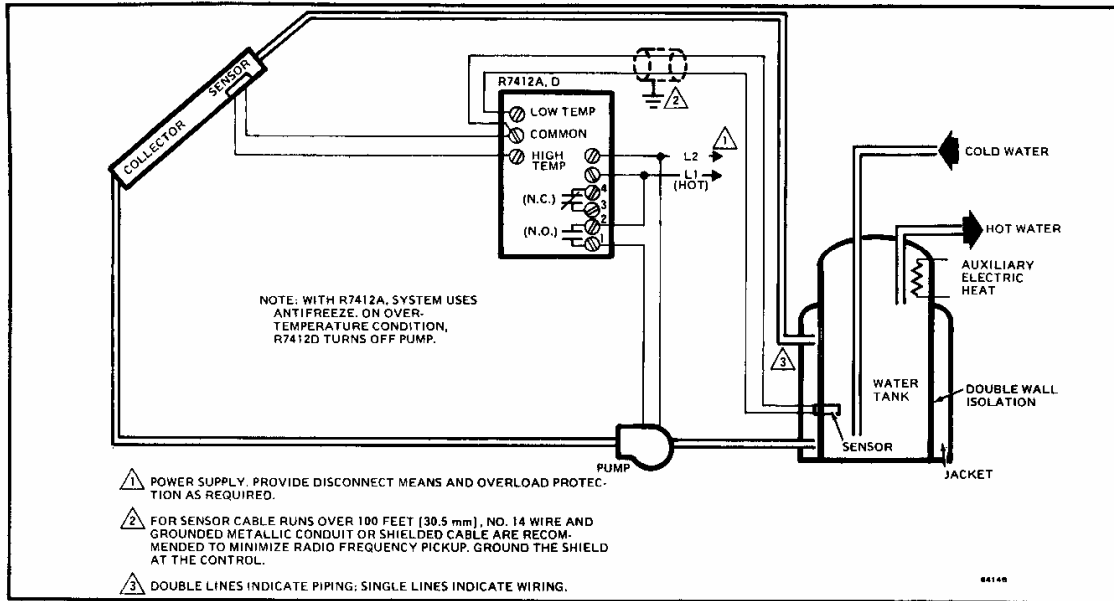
USING THE R7412A,D WITH A SOLAR WATER HEATER.
